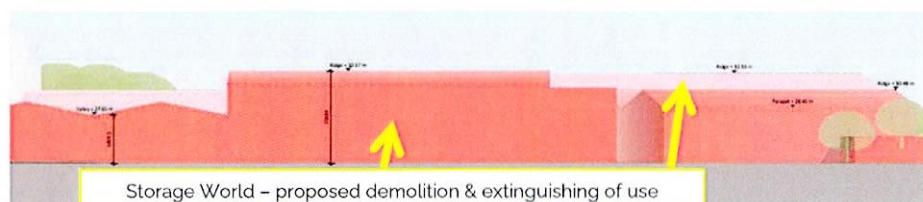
Excerpt from Applicant's proposed demolition elevations (3)
